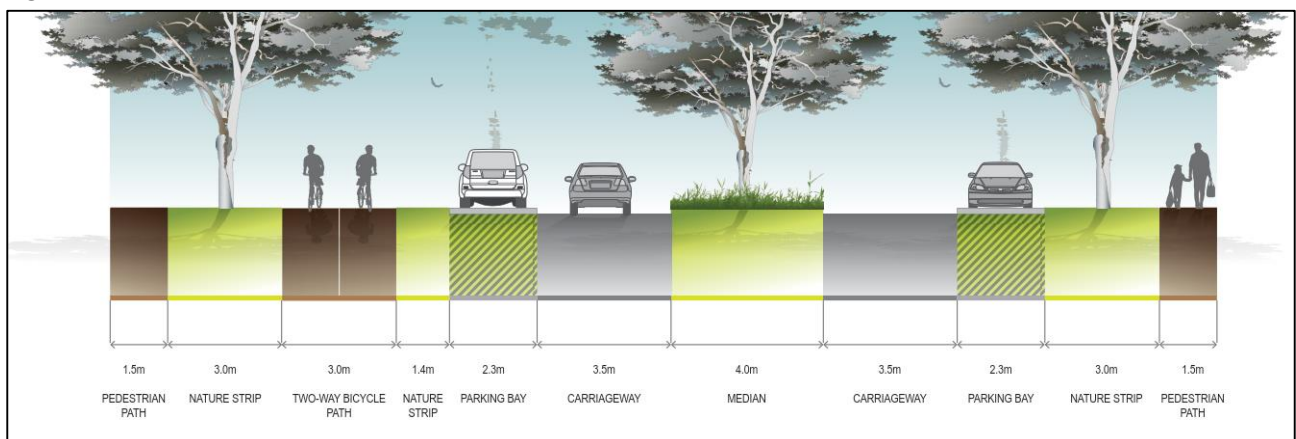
Craigieburn Road East (CS01a – 41metres)
